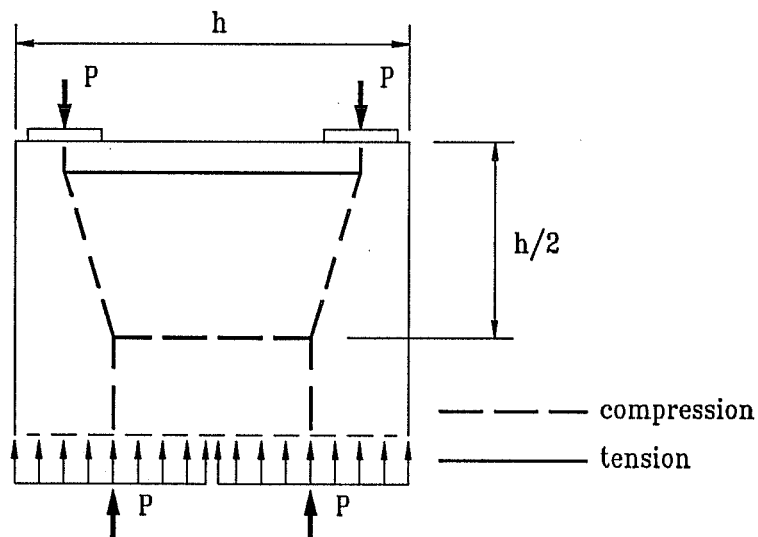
Spalling Forces Between Multiple Anchorages
